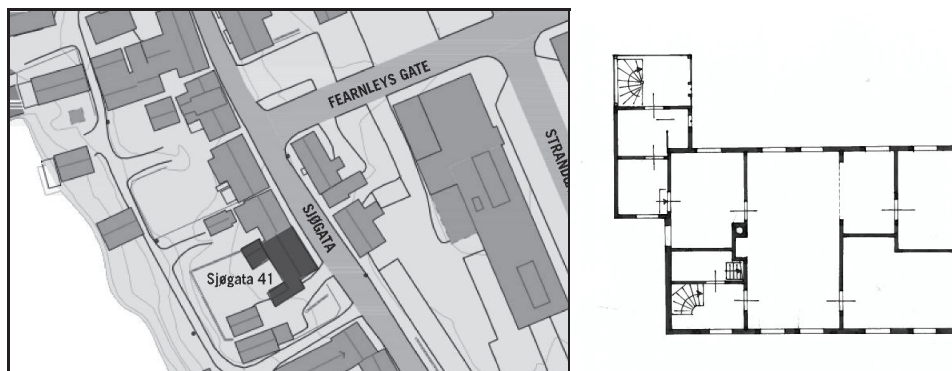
Sjøgata 41 site plan (left) and upstairs floor plan (right), (August Schmidt 2010)
